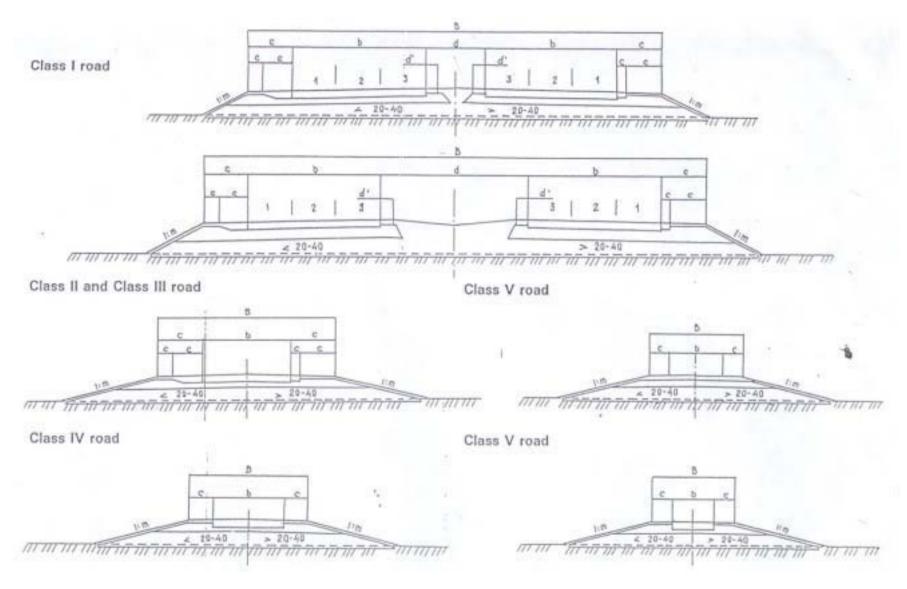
Typical cross-sections according to SNiP 2.05.02-85
